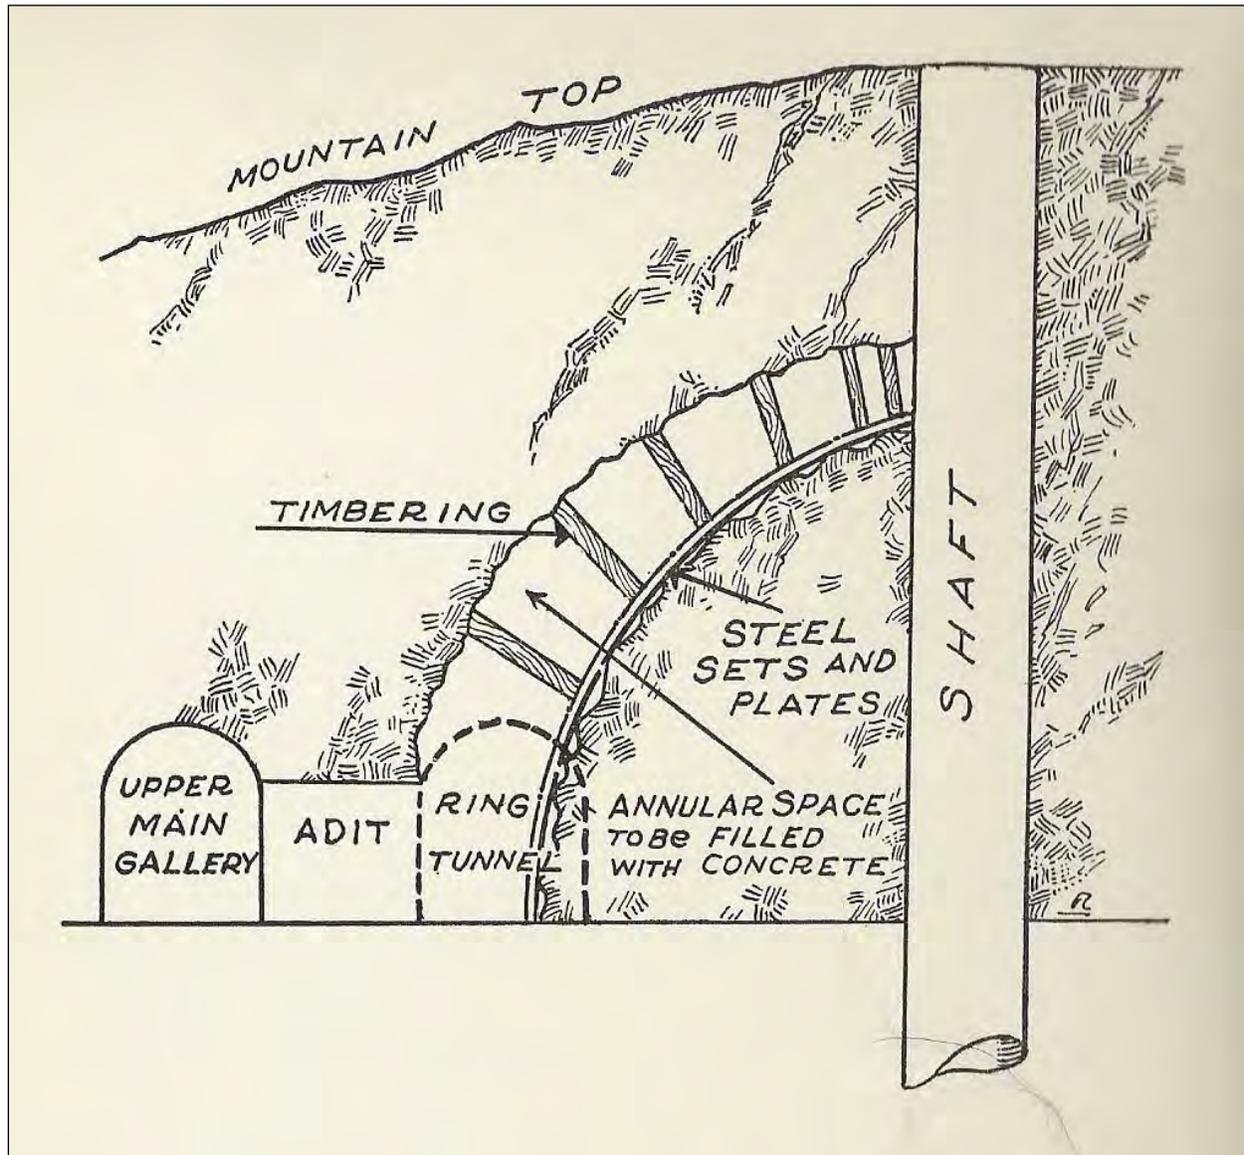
displays how each chamber excavation began. The upper dome of each chamber fuel chamber was excavated first, starting with a ring tunnel, and then working upward towards the central shaft.
